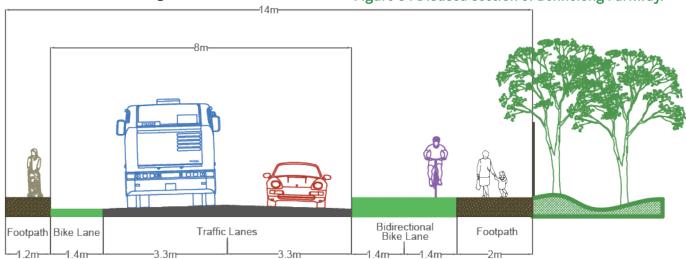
Proposed reconfiguration of Bennelong Parkway, looking north
